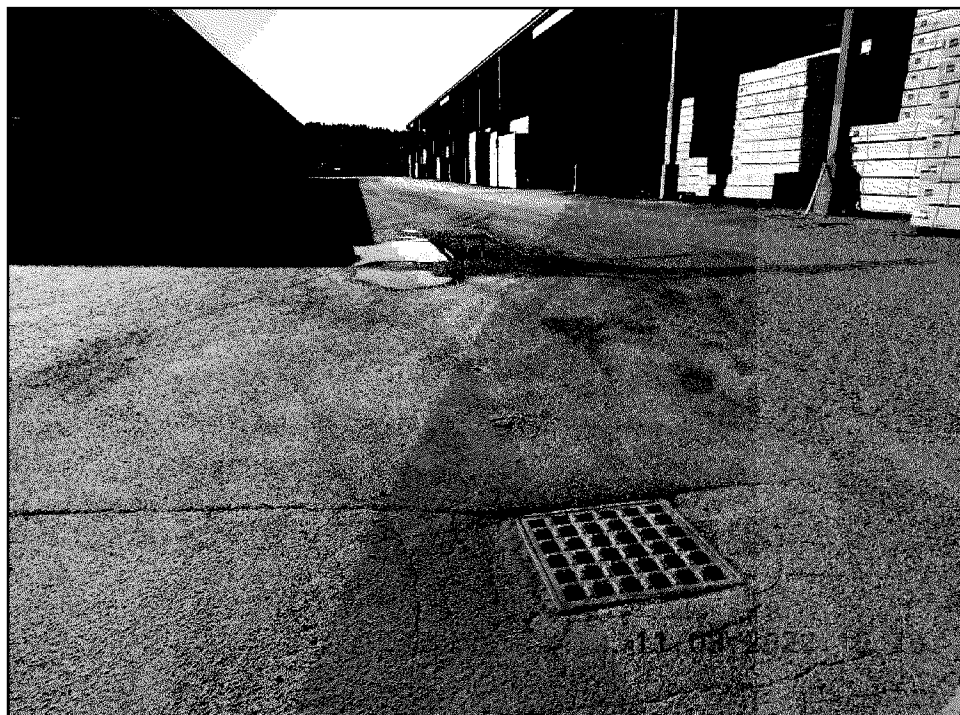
View, facing south, of the ditch that conveys stormwater to the southeast basin.
